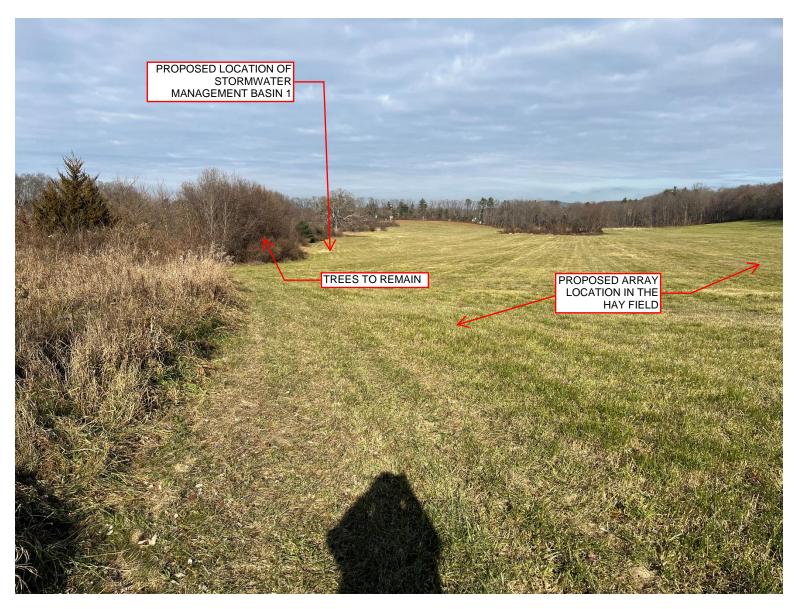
VIEW OF PROJECT SITE LOOKING NORTH
